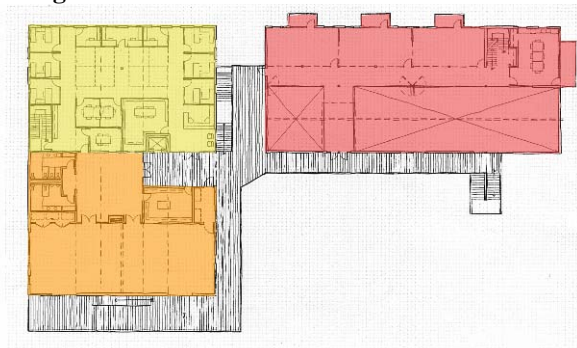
Second floor plan showing office area in yellow, conference center in orange, and classrooms for boat building demonstration in red.
